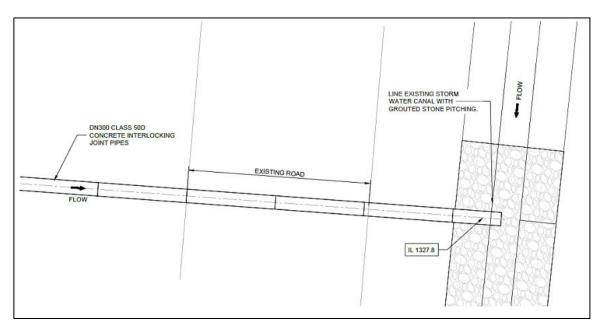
Outlet Pipe Discharging Into Existing Stormwater Drain (Drawing 02-T-1310)
